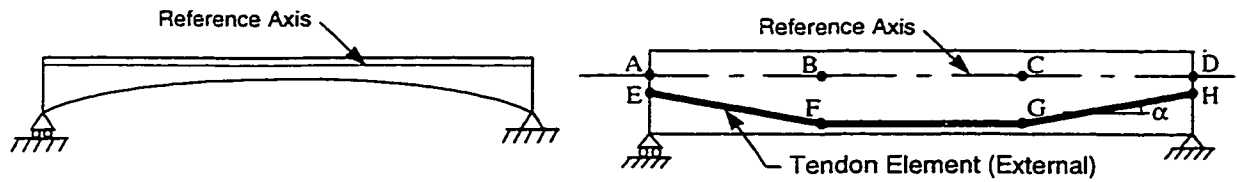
(a) Typical Reinforced or Prestressed Plane Structure
